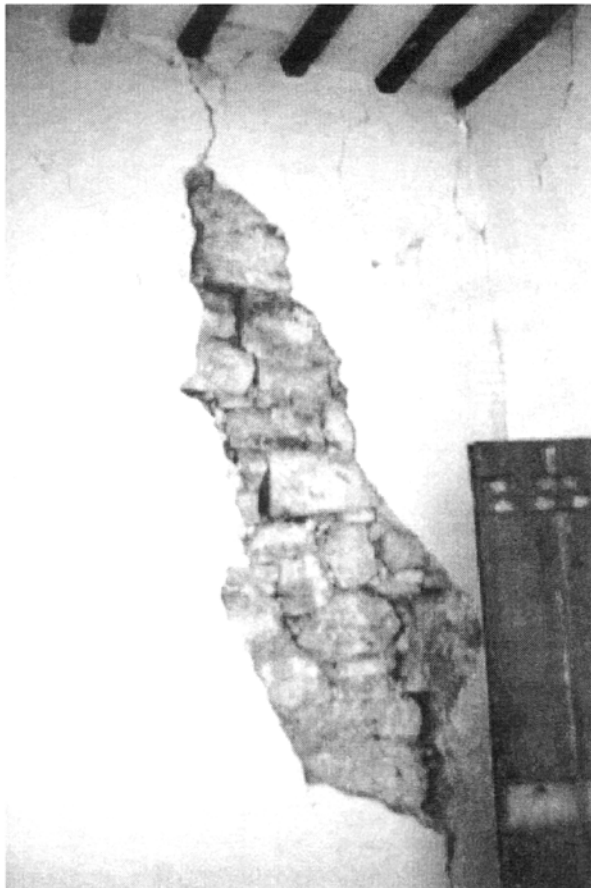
Frati Minori Convent: shear cracks in cross walls reveal rubble masonry with stone wedges and bricks.
